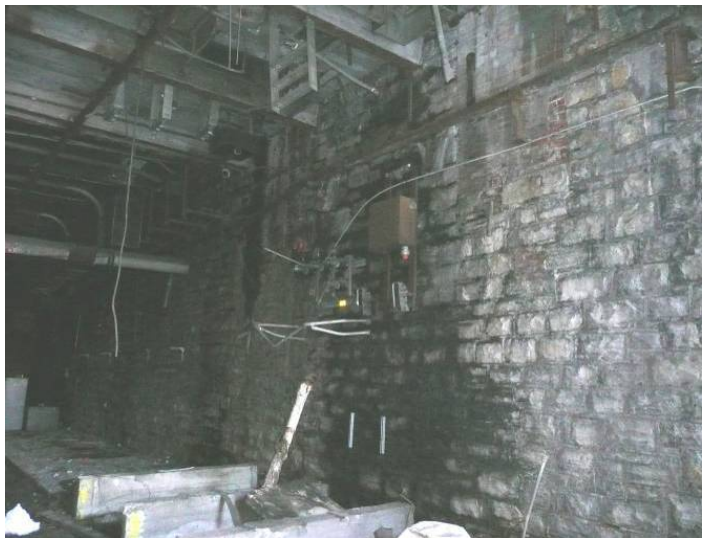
Interior of electrical system on northeast elevation of sulfite mill.
